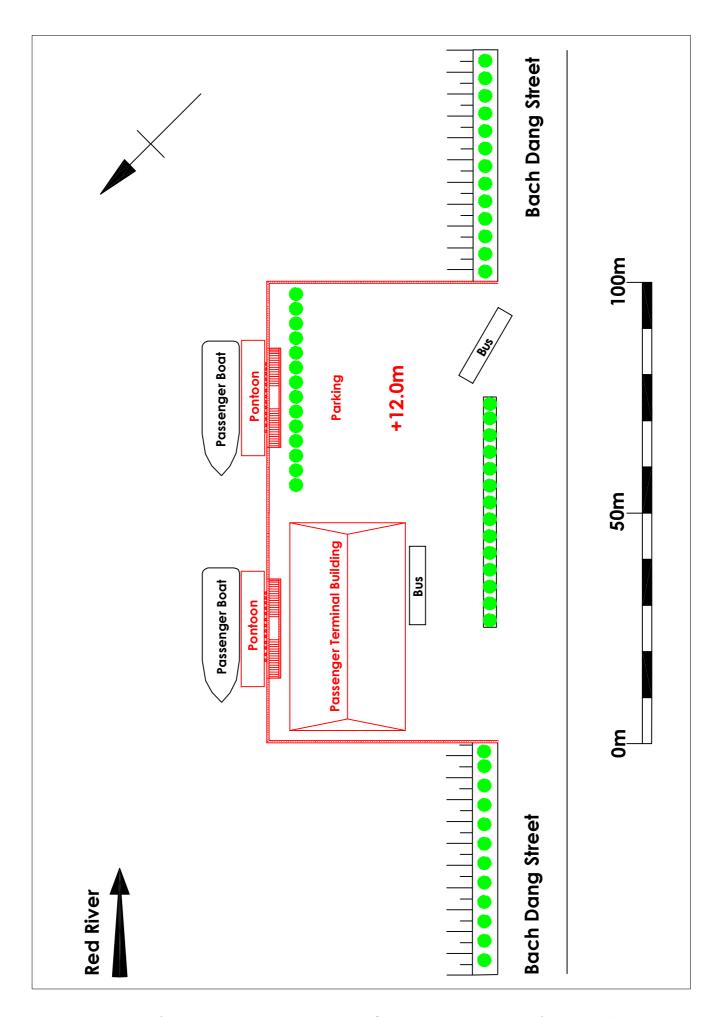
Layout Image of New Passenger Terminal (2010)
